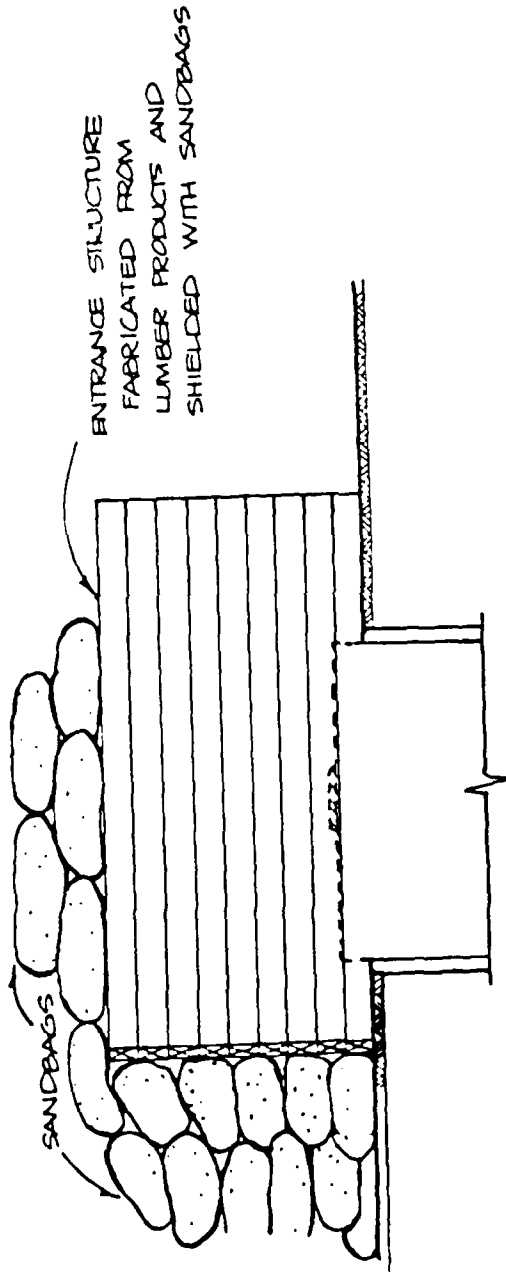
Radiation Protected Entrance Structure to Below Ground Shelters.
